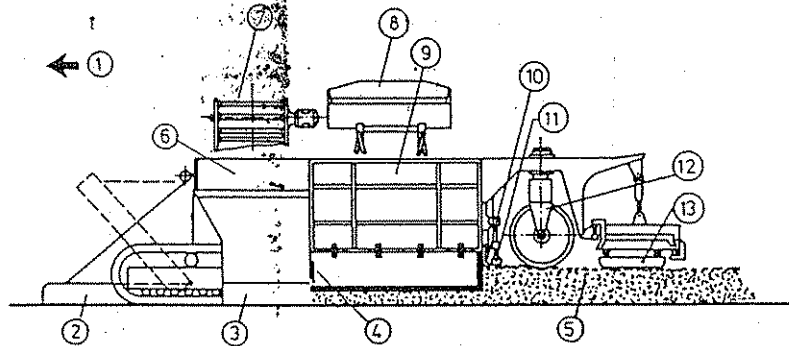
Internal sealing of asphaltic concrete. Longitudinal section of the placing unit (courtesy of Strabag Bau-AG).
